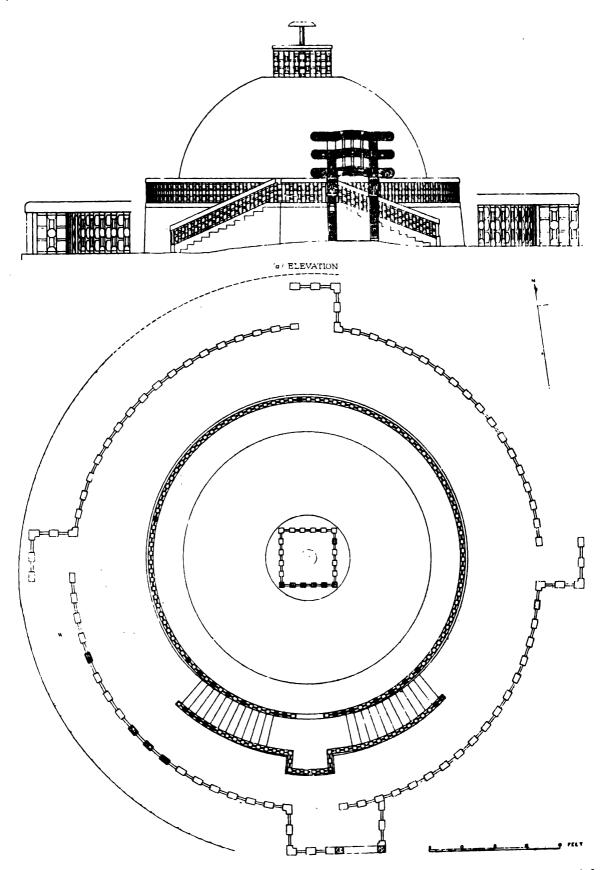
Elevation and plan of stupa 3. Note the direction of north-south; same as stupas 1 and 2.
